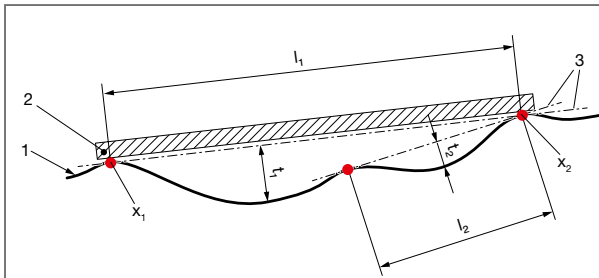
Checking the depth gauges, e.g. by means of levelling staff and V-head
